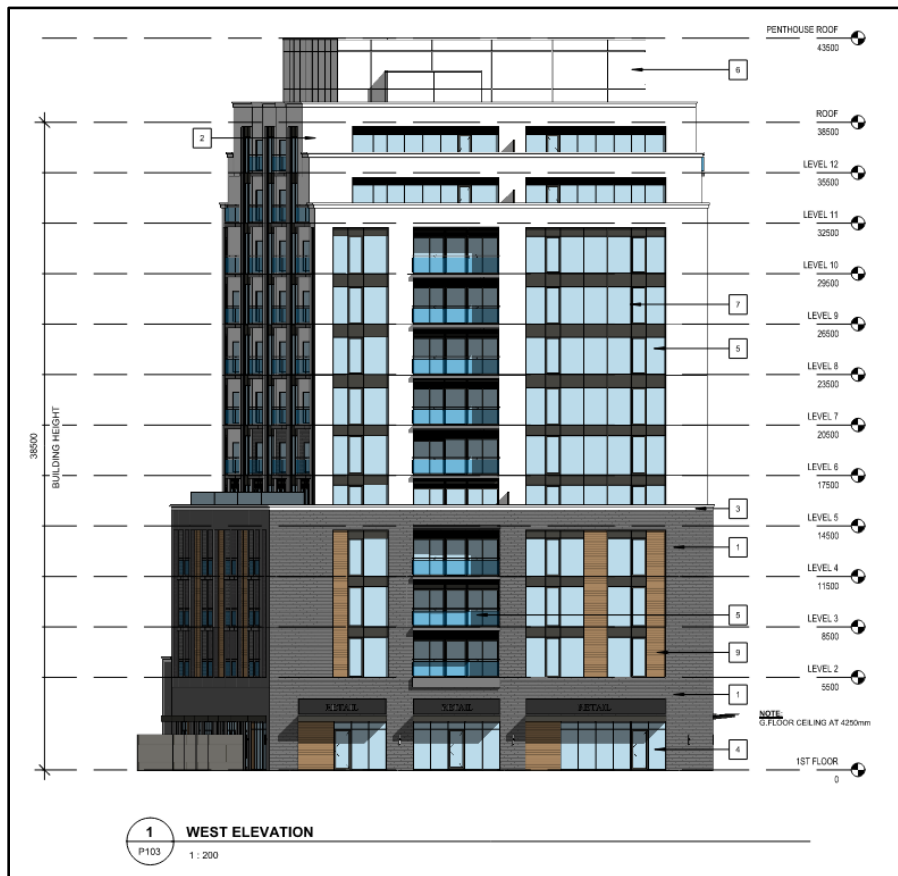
Conceptual west (Hurontario St.) elevation of Building 3. Source: Richard Ziegler Architect Inc.
